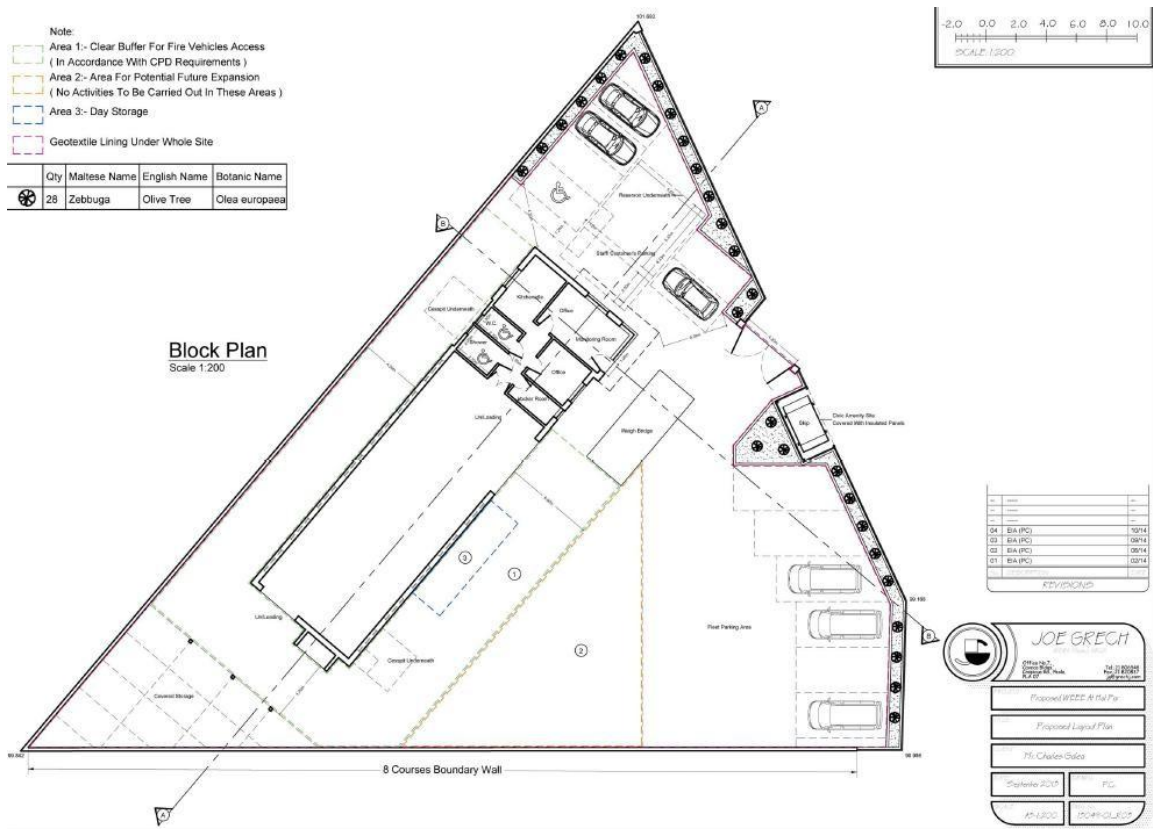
Site Layout plan for the proposed site at Hal far showing the proposed Recycling Plant and related facilities
